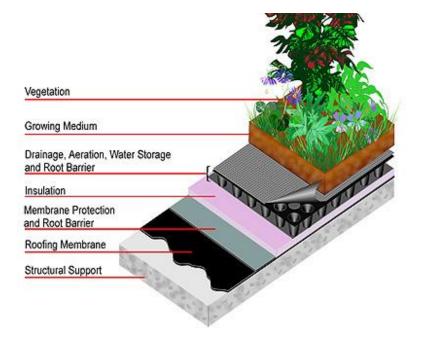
Typical Green Roof Construction Layers (Detrich B. Allen, 2007)
